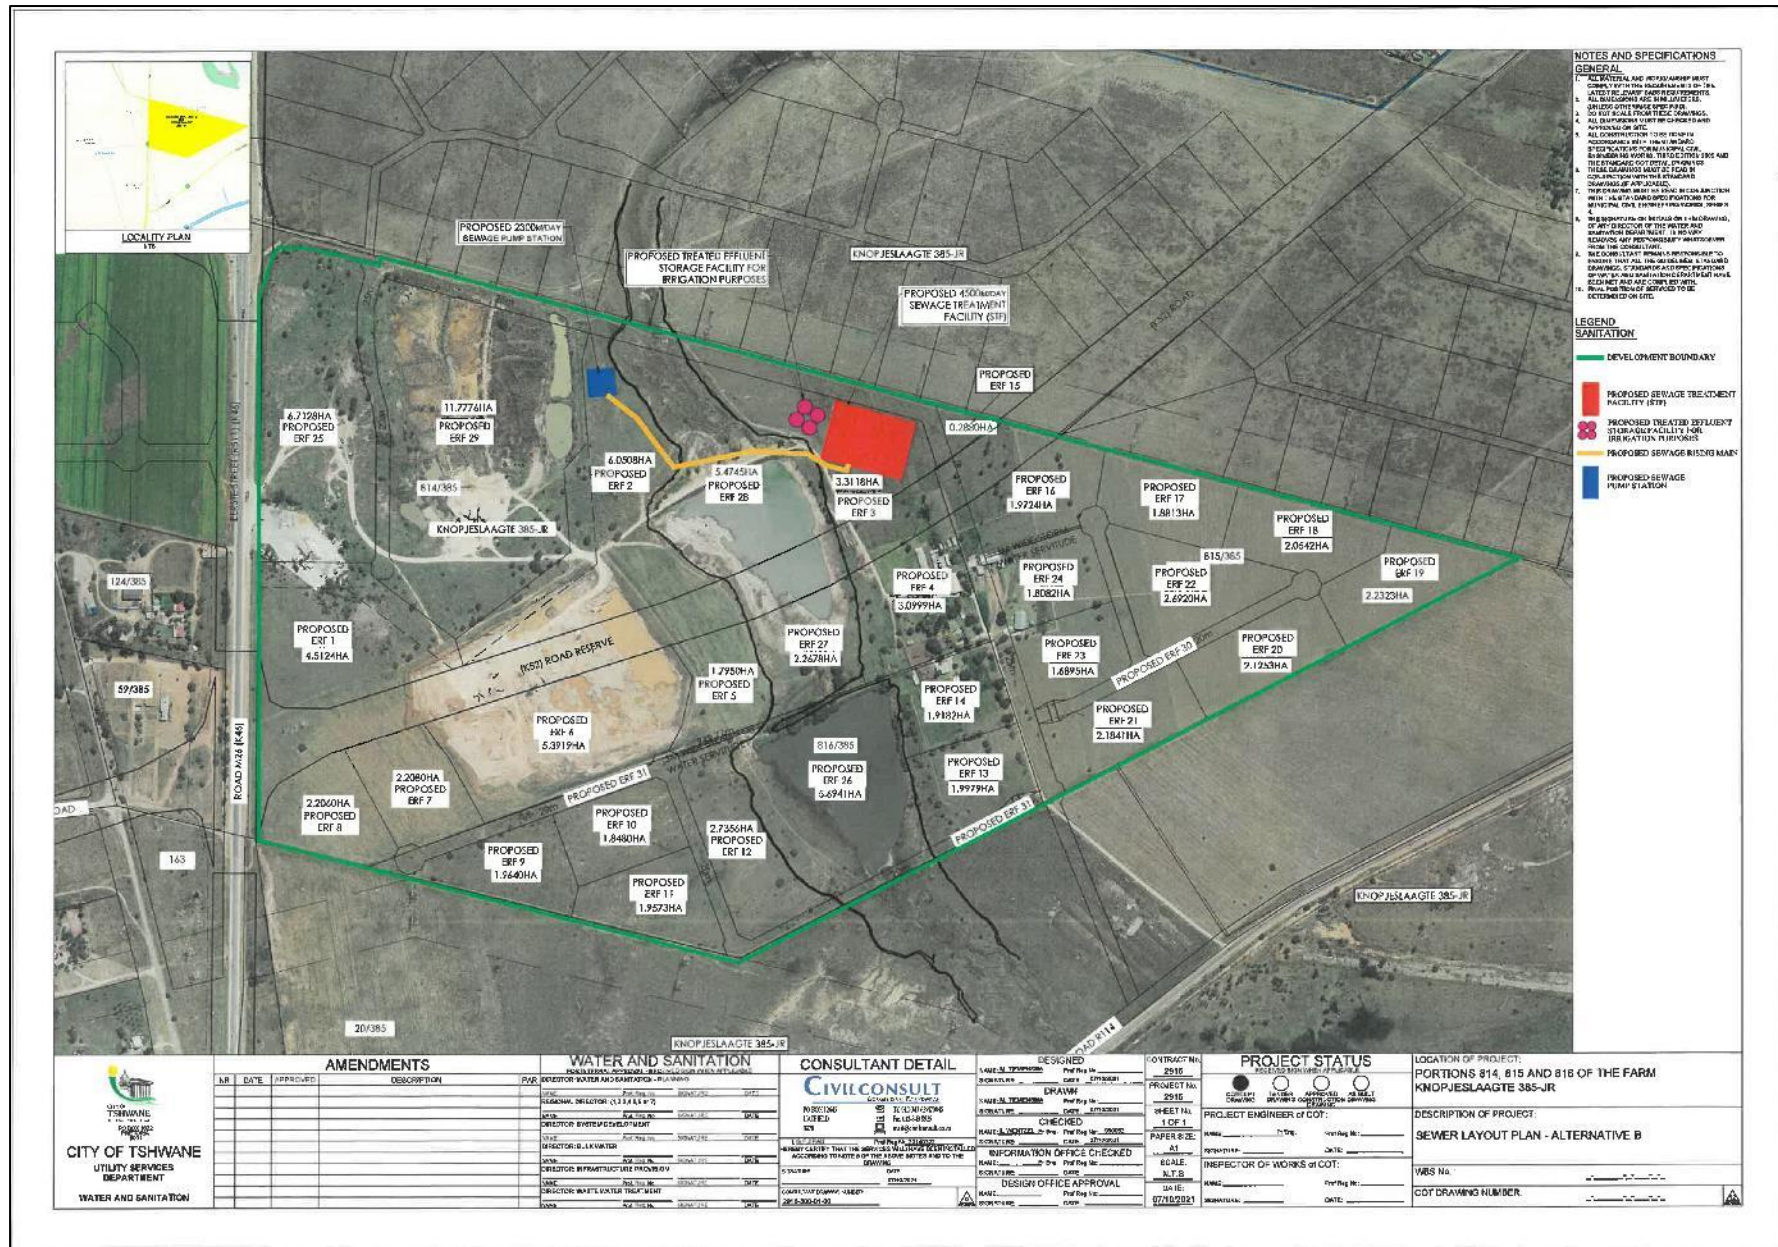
Other images available: Sewer Layout Plan – Alternative B (Interim if existing services cannot be obtained)
